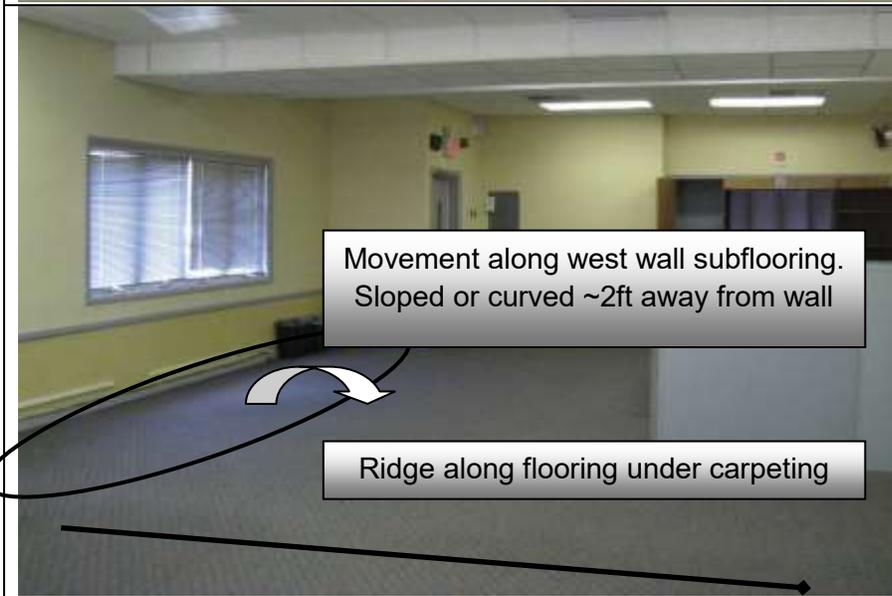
2nd floor west side empty room. Movement in sub flooring along west wall by windows. There is a curve or slope ~2ft away from wall. Not able to evaluate below carpeting.
